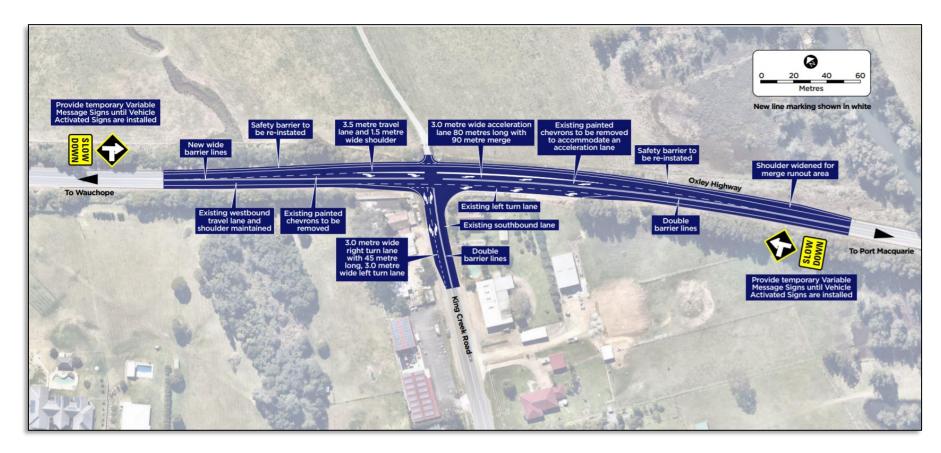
Proposed Improvements at the Oxley Highway and King Creek Road intersection, November 2021
